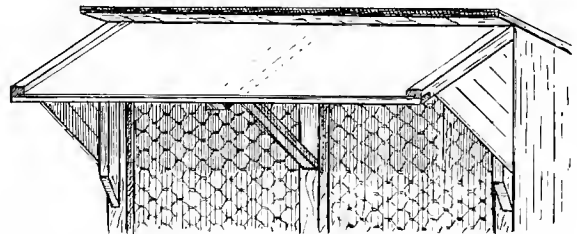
A WEATHER-BOARD FOR A LEAN-TO HOUSE
